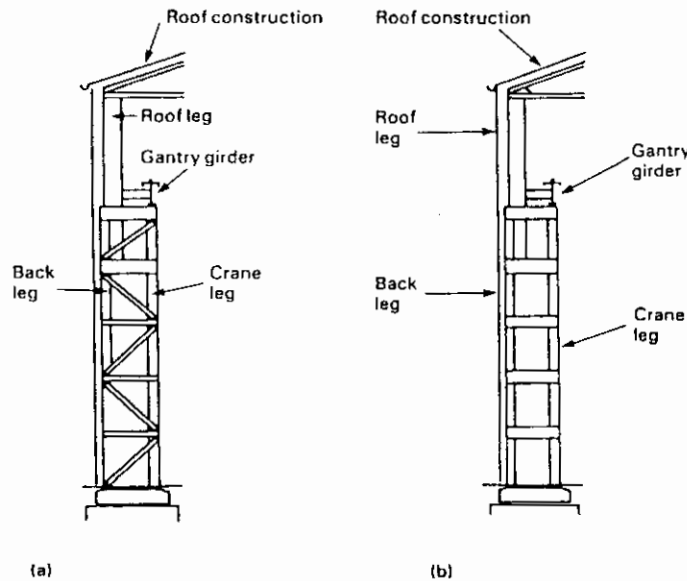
Compound columns suitable for supporting crane gantries in industrial buildings: (a) laced column, (b) battened column. (Bates, Constrado Publications.)
